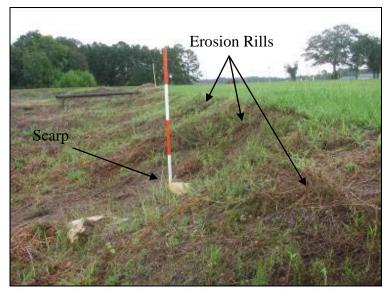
Ash Pond – Southeast embankment interior slope, looking northeast. Note: erosion rills and surficial scarps.
